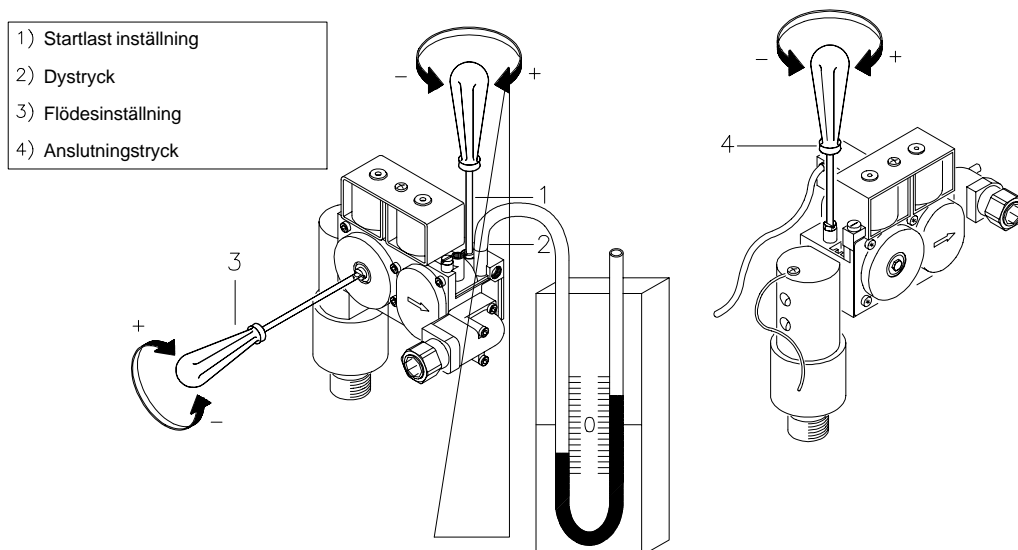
Adjusting the pressure on the electrovalve and the pressure sockets
